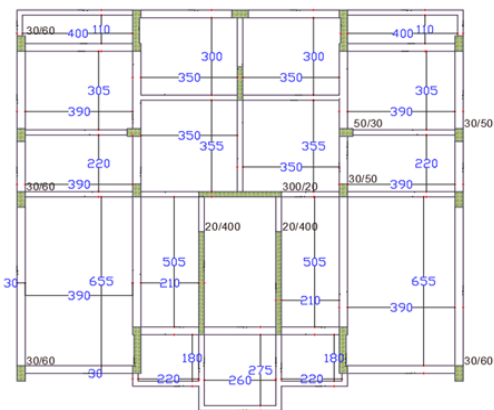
Belonging to the modelled structure floor plan (centimeters)
